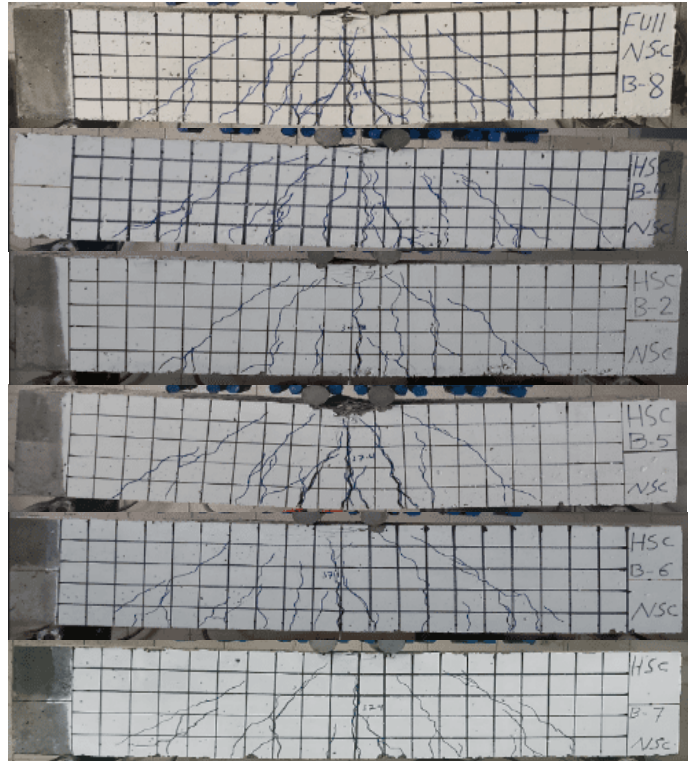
Group (B) Cracking pattern of the test specimens (B2, B4, B5, B6, B7, and B8)
